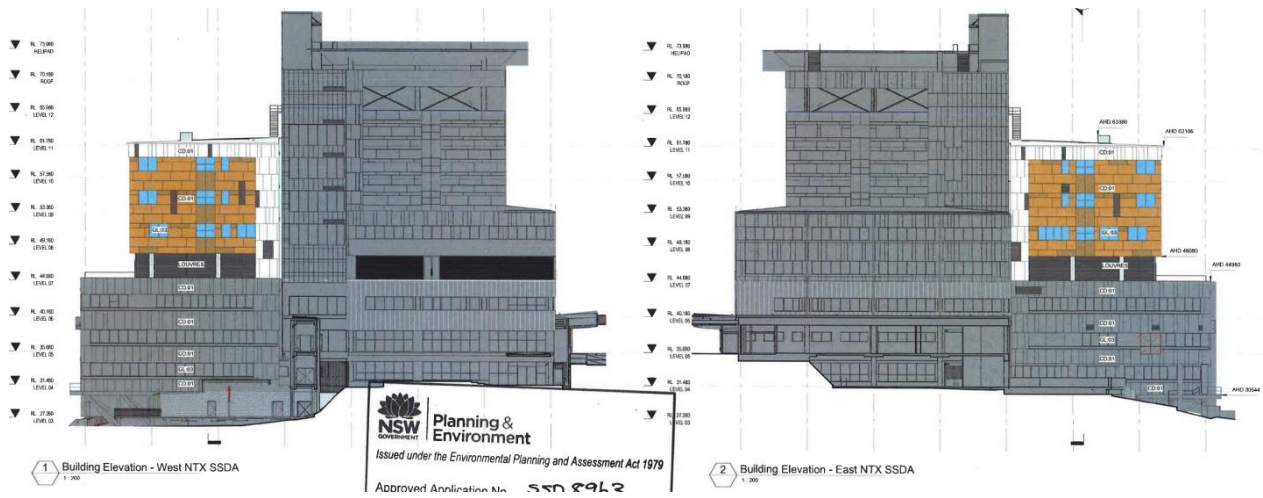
Approved Western and Eastern Elevation Plans (Source: CGA)
